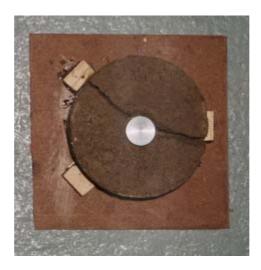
Two-plane failure of DPTT specimen (Note centring block and disc)
